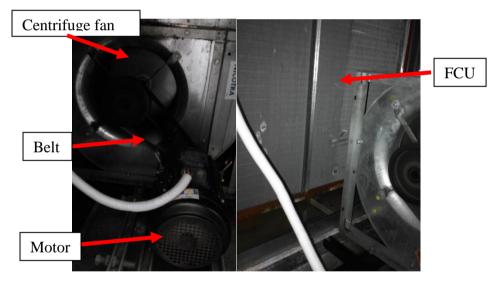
AHU internal view of motor, centrifuge fan and fan coil unit
